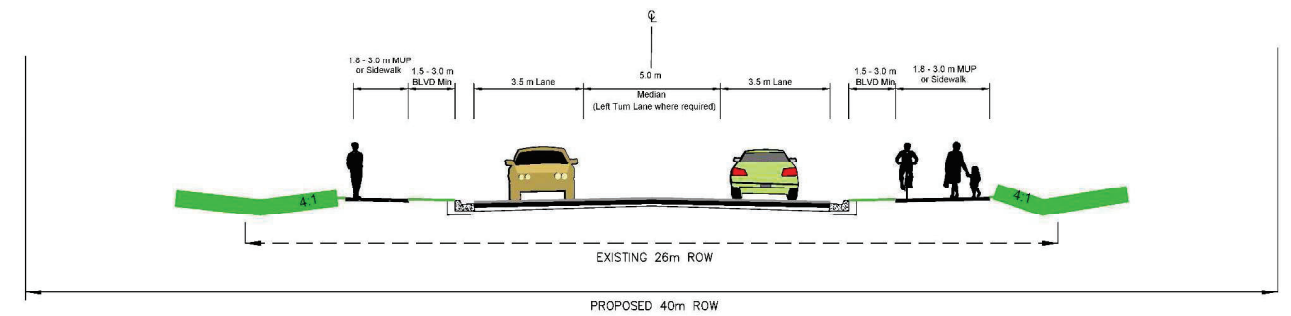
Section 2 Alternative 4 - 3-Lane Urban Cross Section
